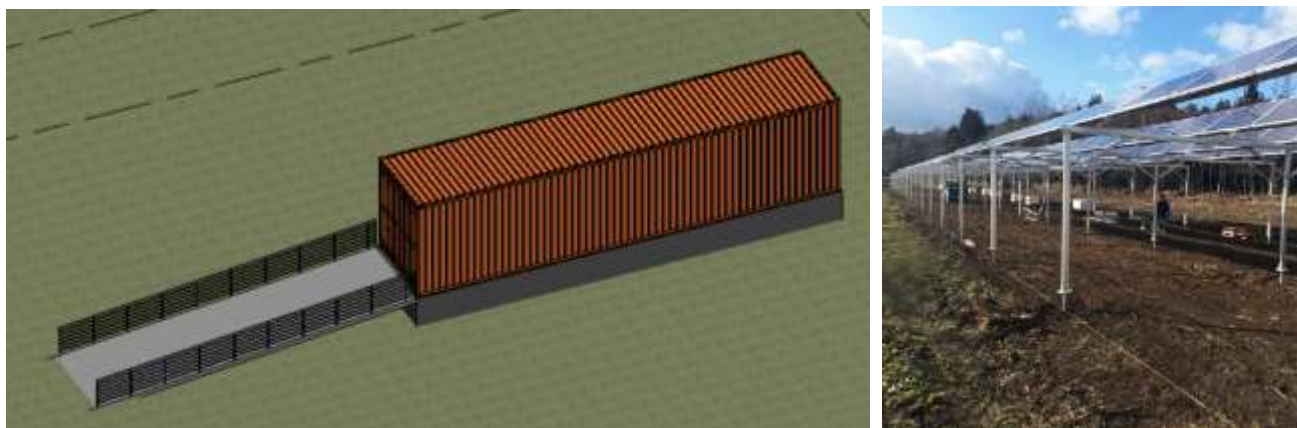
3D rendition of the BESS container (left) and typical solar panel setup on metal supports (right)
